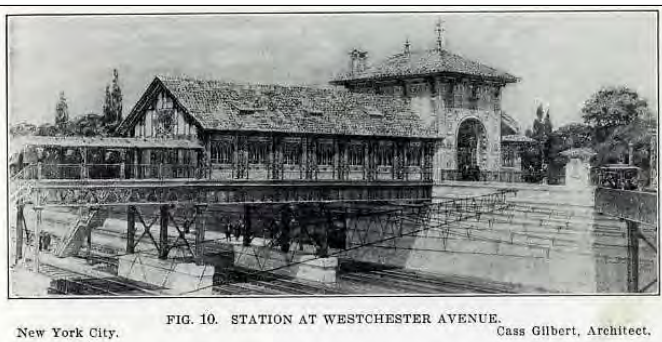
An illustration of the southwest view of Westchester Avenue Station; date unknown. Note the canopied pedestrian bridge to platform stairs across the tracks. *Photographic source: <https://archimaps.tumblr.com/post/142028689492/cass-gilberts-design-for-the-westchester-avenue>
